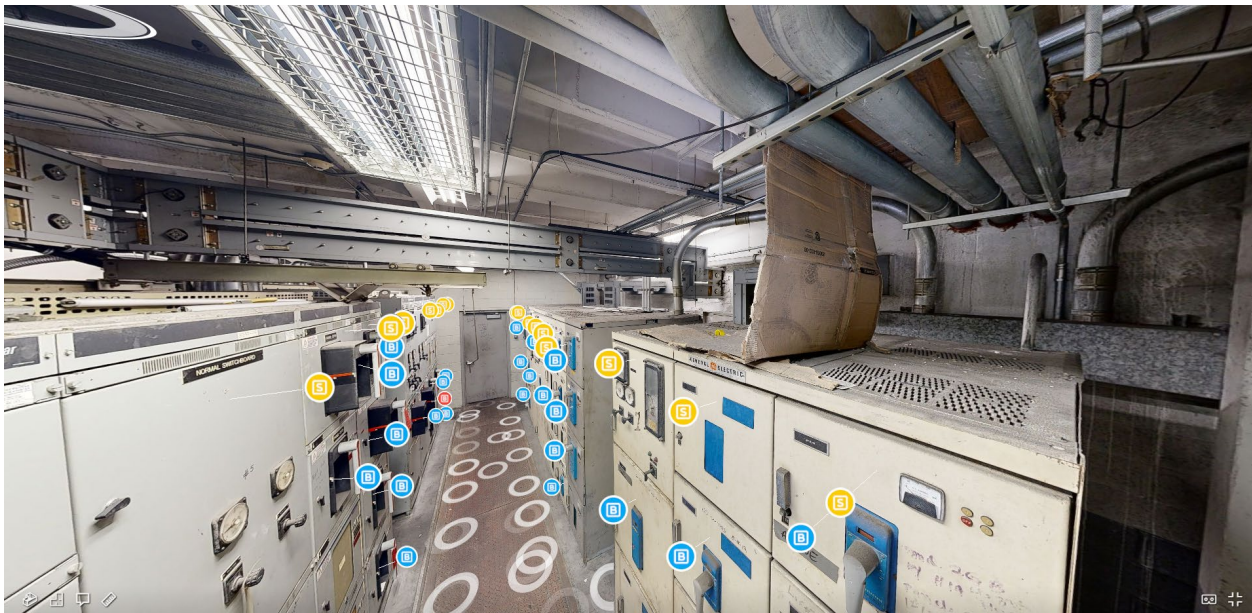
Matterport image of overhead room setup/condition taken from exterior doors, towards south side of the room.
